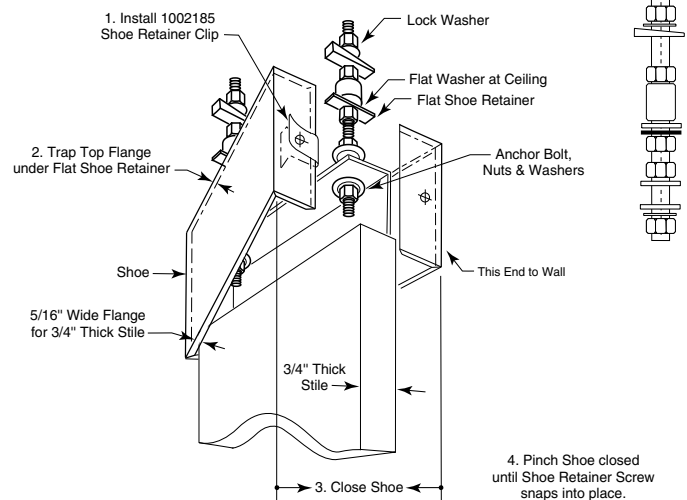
Installing Shoe on Stile Mounted Against Wall.
